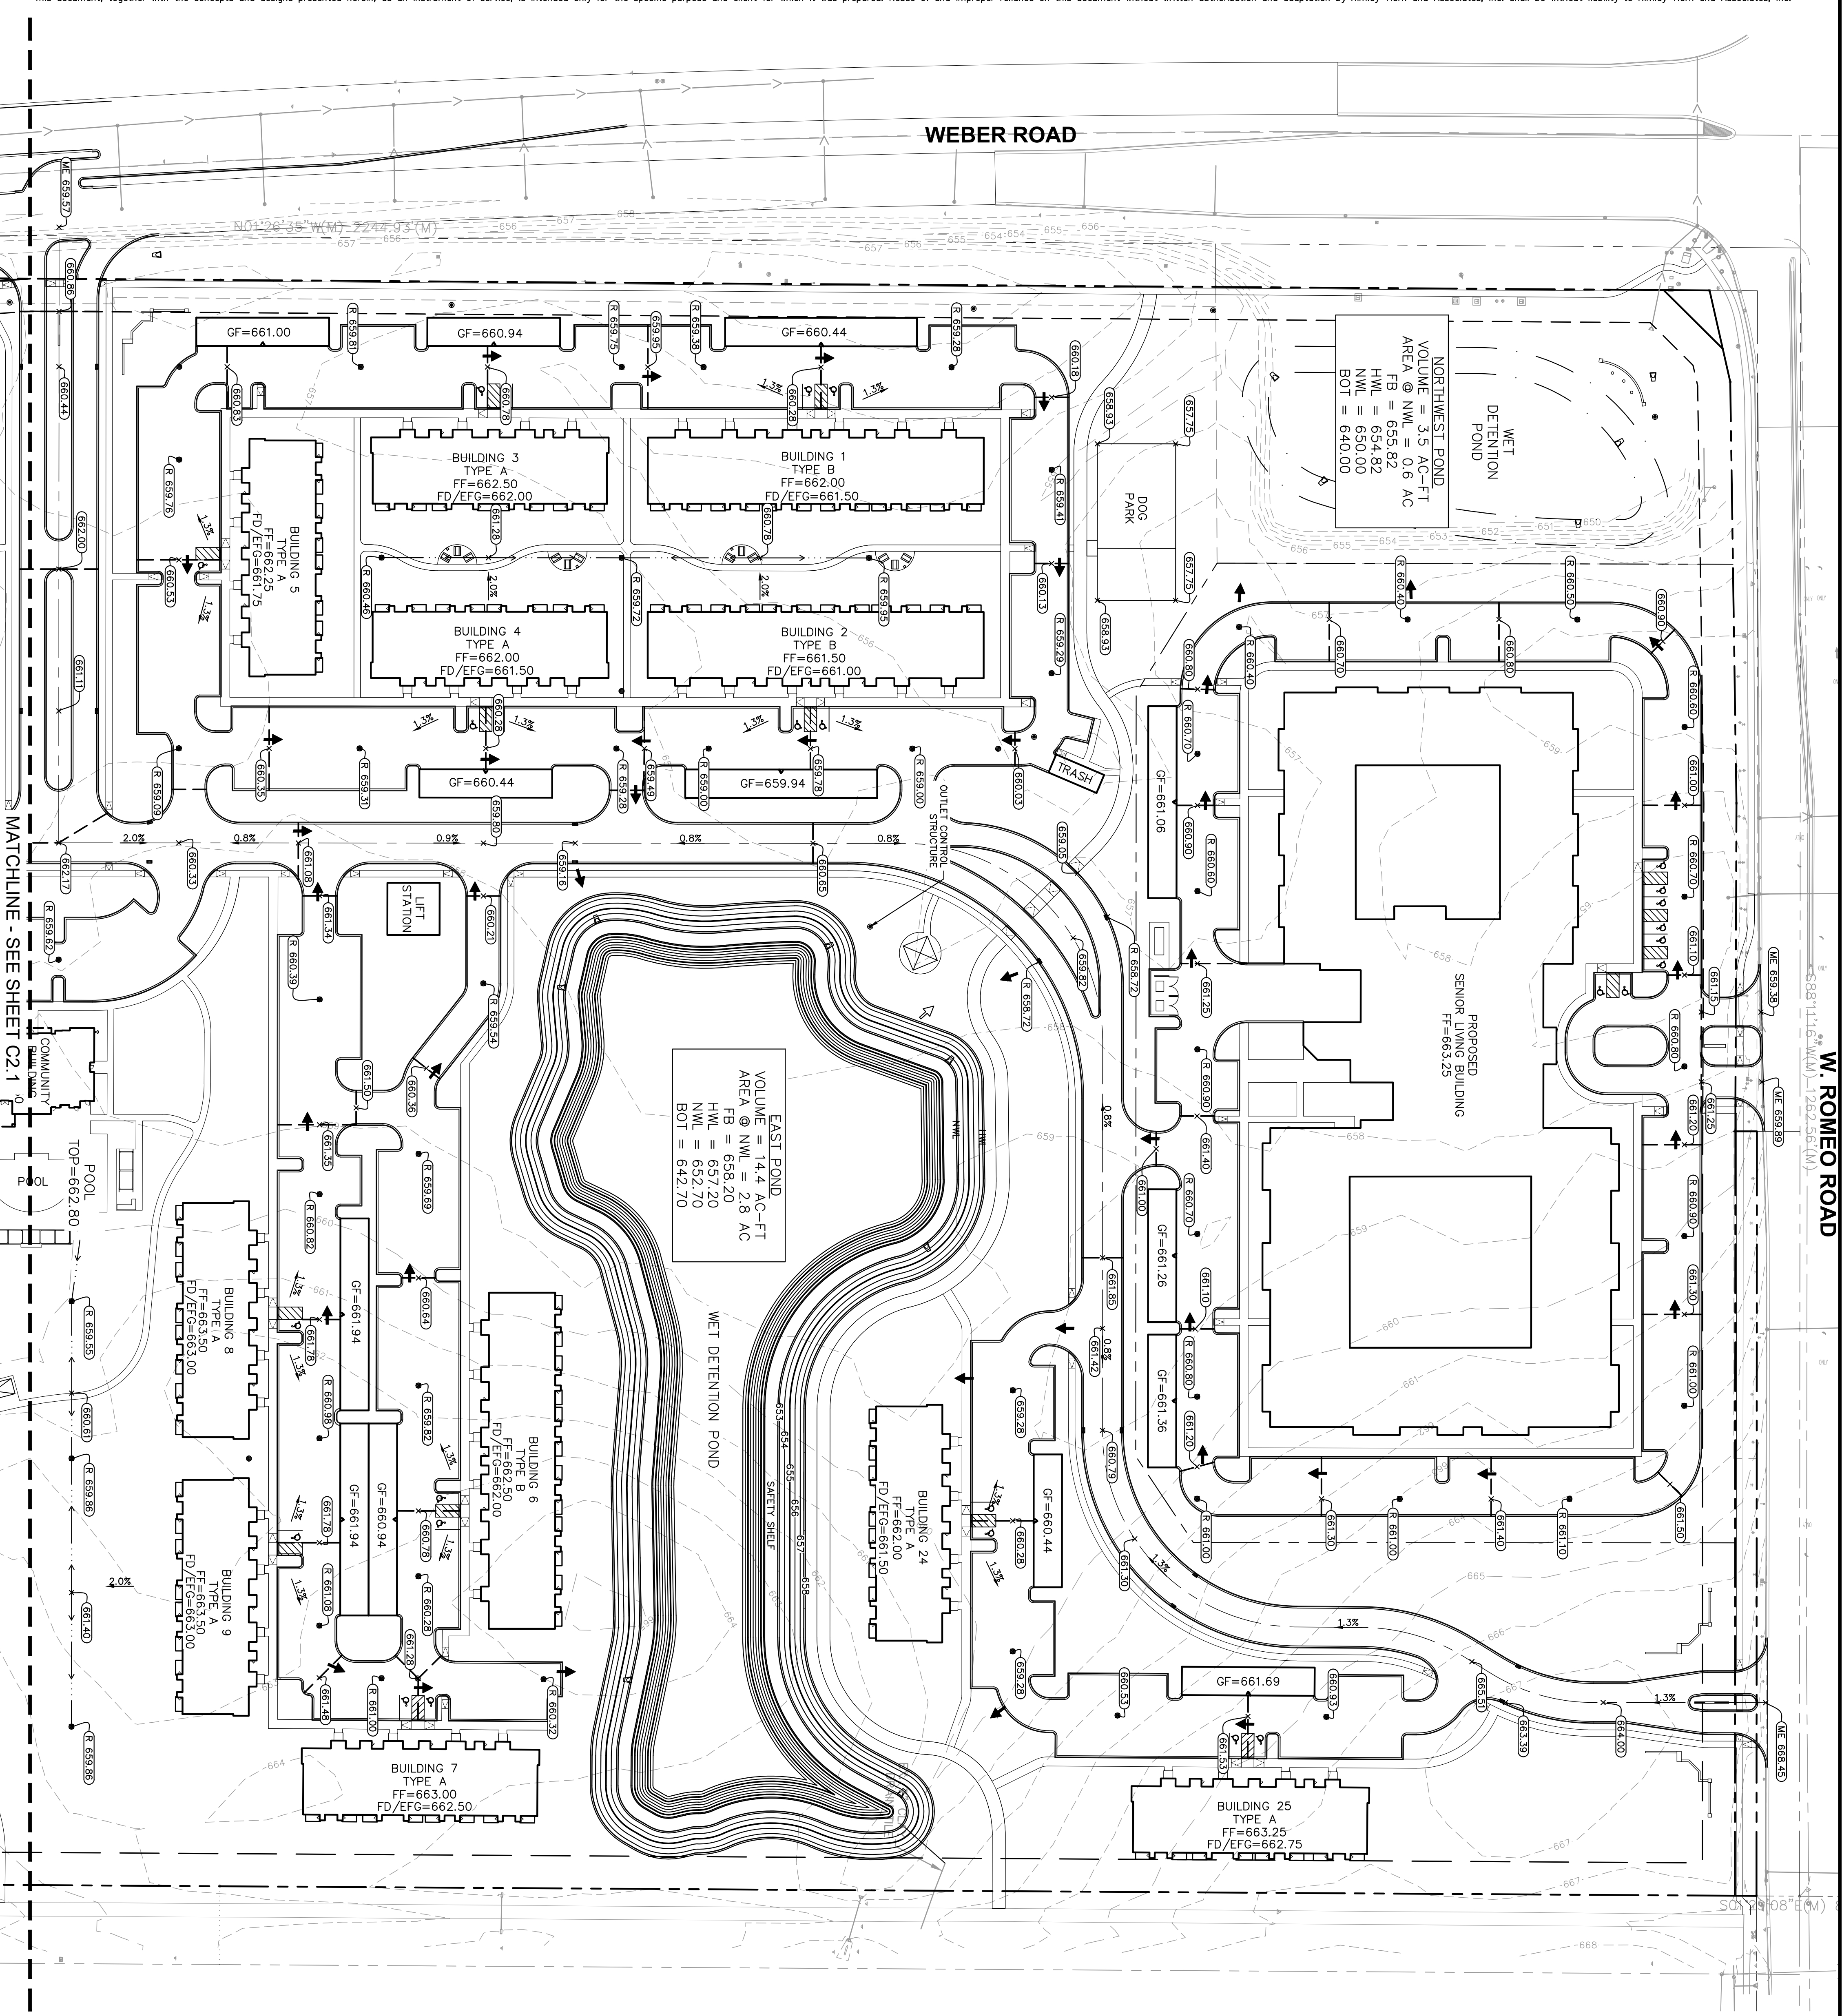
"Stormwater Management Facility Design and Landscaping Plan"
